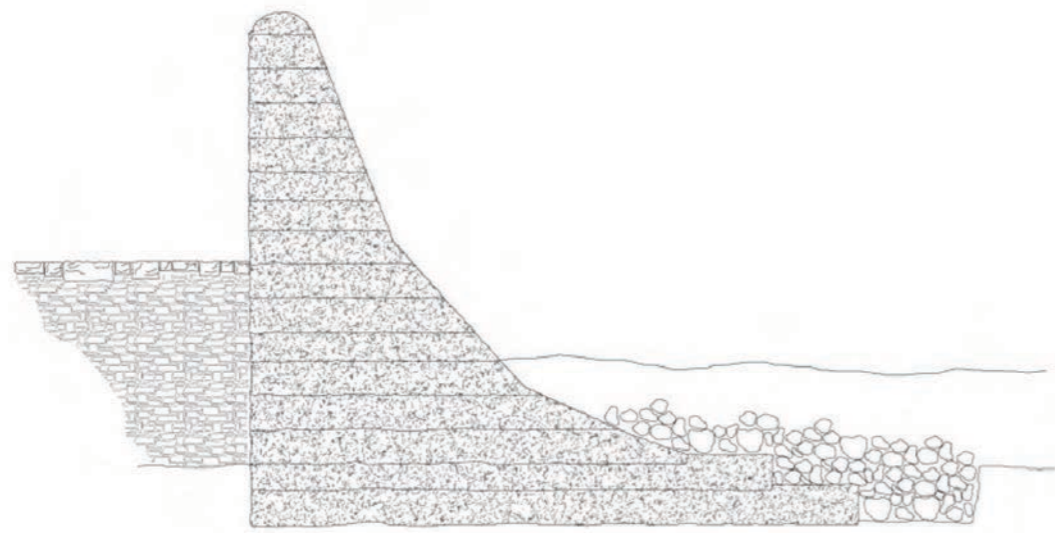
, Author, "Potential Repair to Mulranny Pier's Walls using Stone", Drawing, 2022
